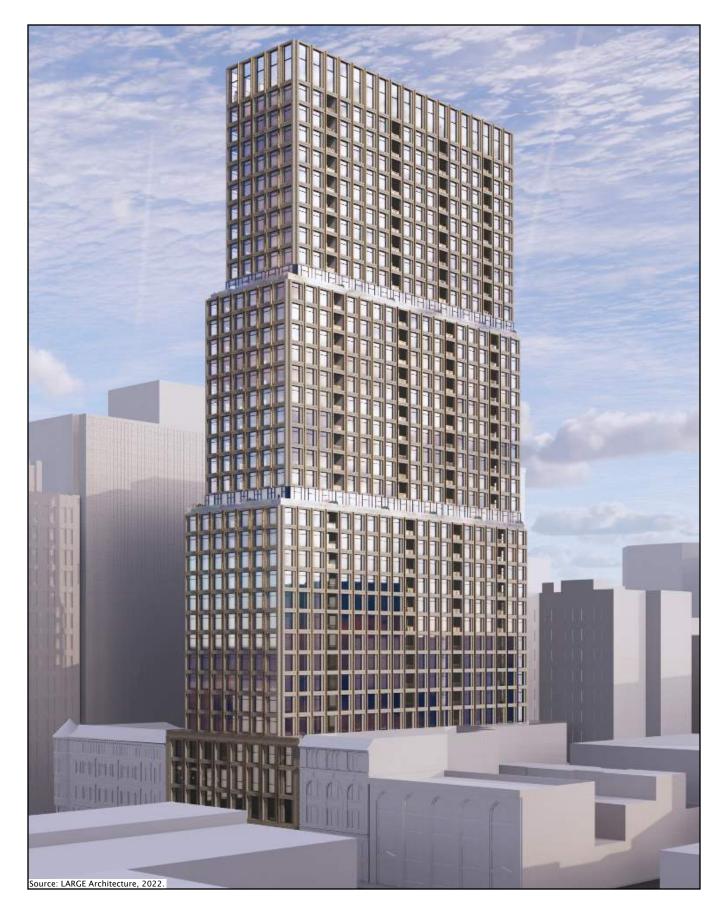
Rendering - View Looking Southwest -1431 Franklin Street Residential Project
